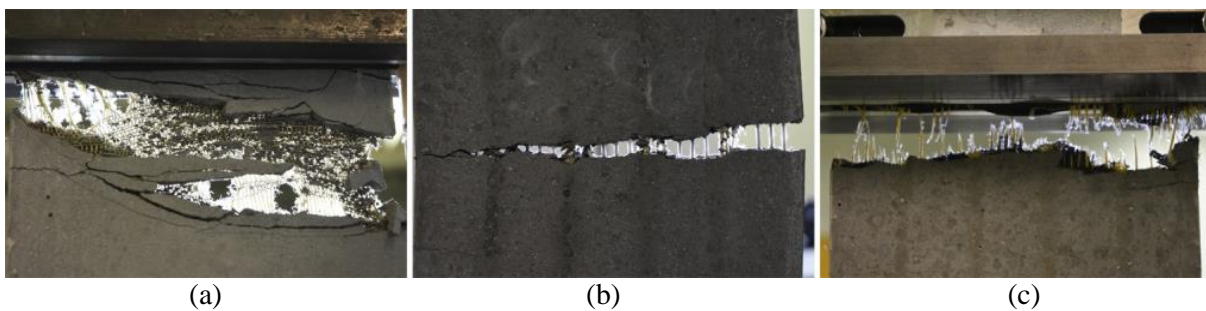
Failure modes: (a) Subsequent failure of interlocked loops and spalling of cover concrete; (b) rupture of outer fibres and pull-out of inner core; (c) full rupture of fibres.
